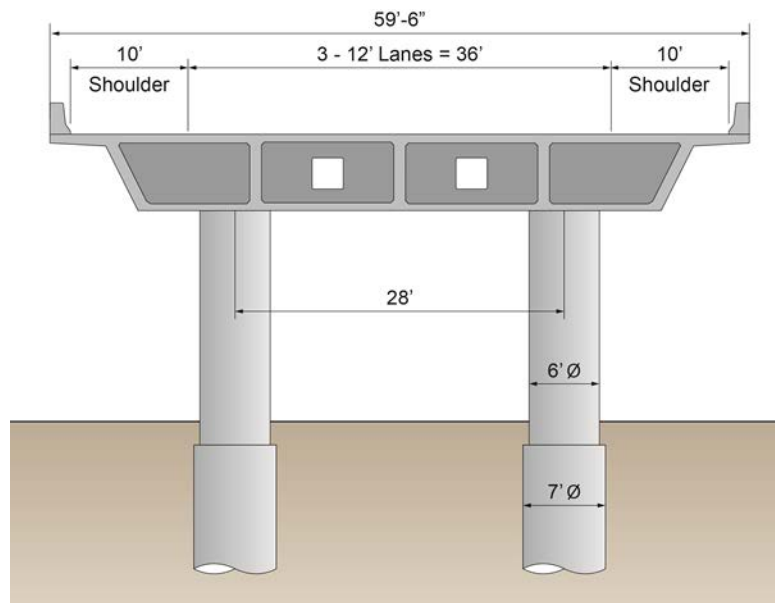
Cross Section of Design Example 1 Bridge at the Piers
